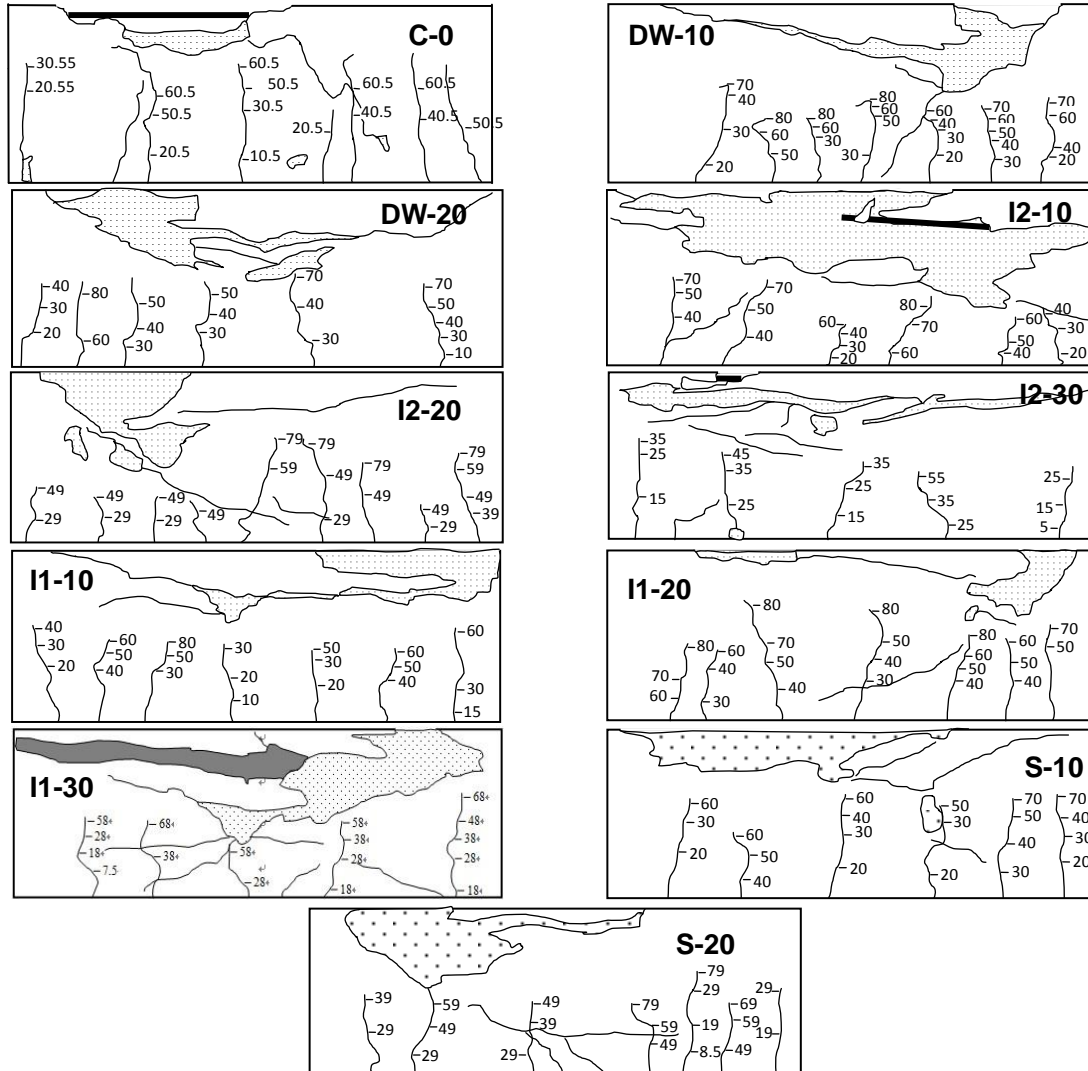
Cracking propagation process in the bending area of the tested beams (Unit: kN)
